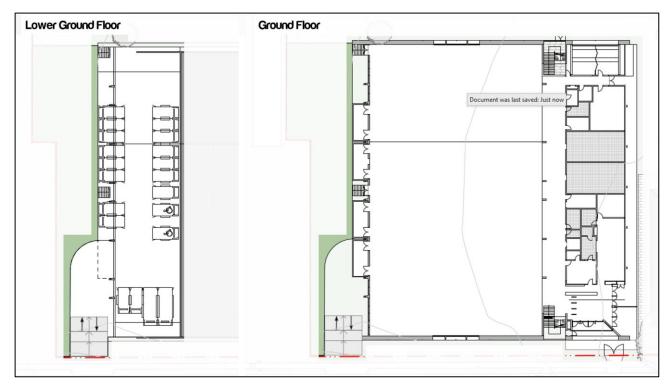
PCYC Facility (Approved Driveway and Basement Carpark Plan)
